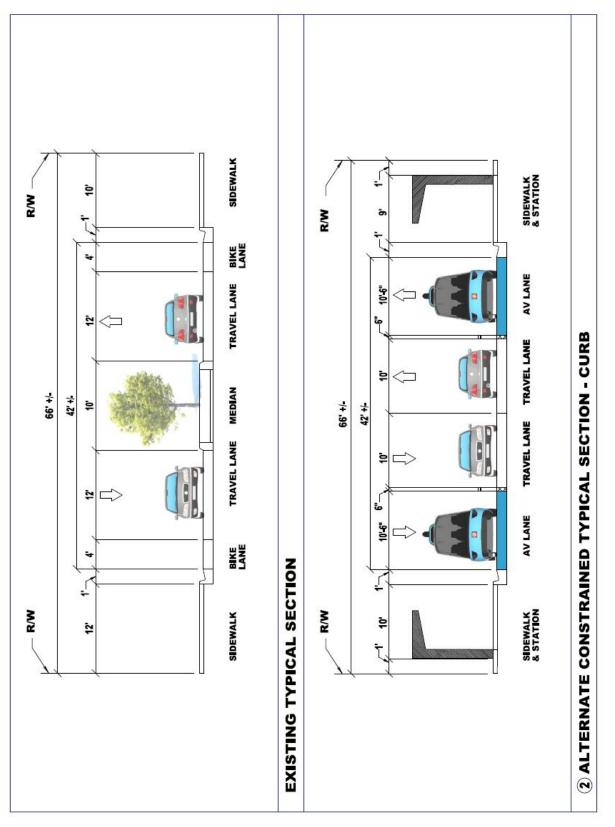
North Corridor Existing and Alternate Constrained Typical Section with Curbside Stations - W. 8th Street
